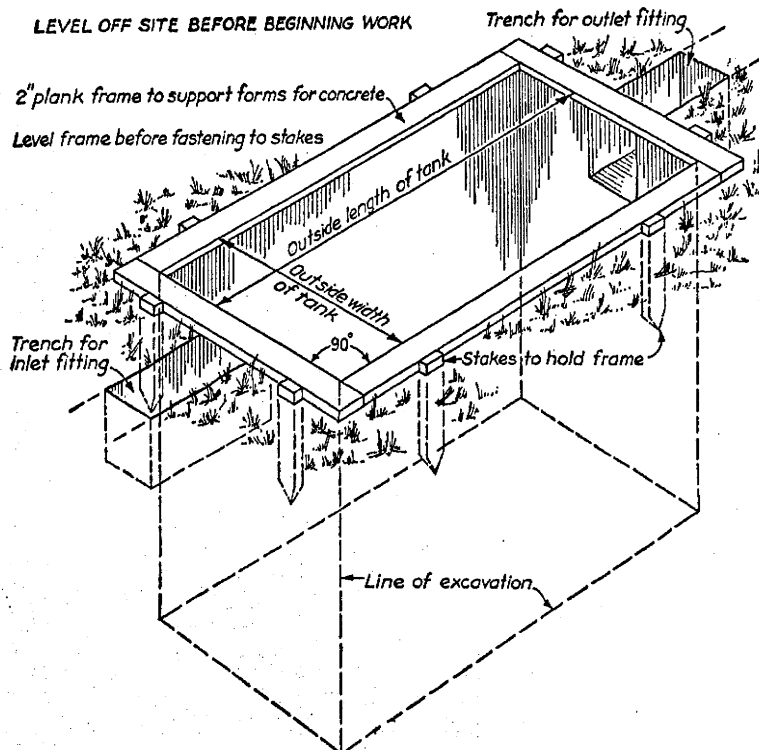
Method of outlining a septic tank excavation on the ground surface.
